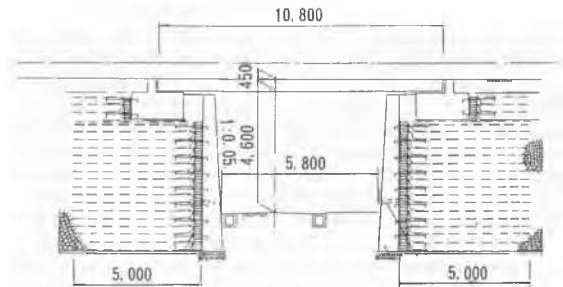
Cross-section of geosynthetic-reinforced soil bridge abutments at Shinkansen Yard, Nagoya
